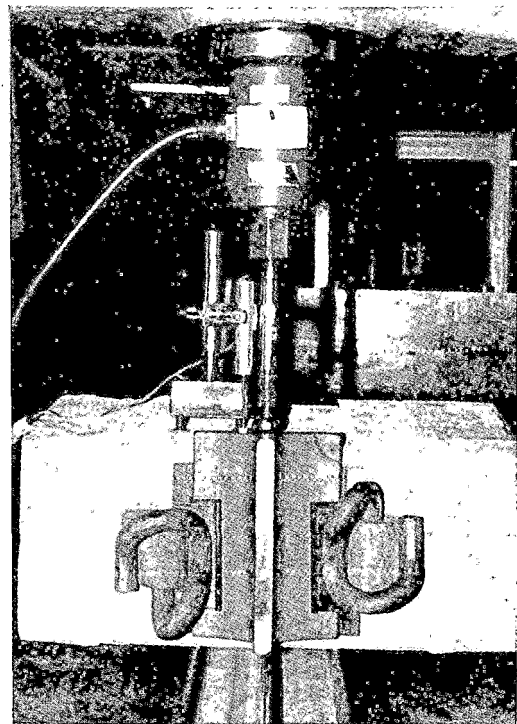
LONGITUDINAL RESTRAINT TEST CONCRETE TIE FASTENER.
